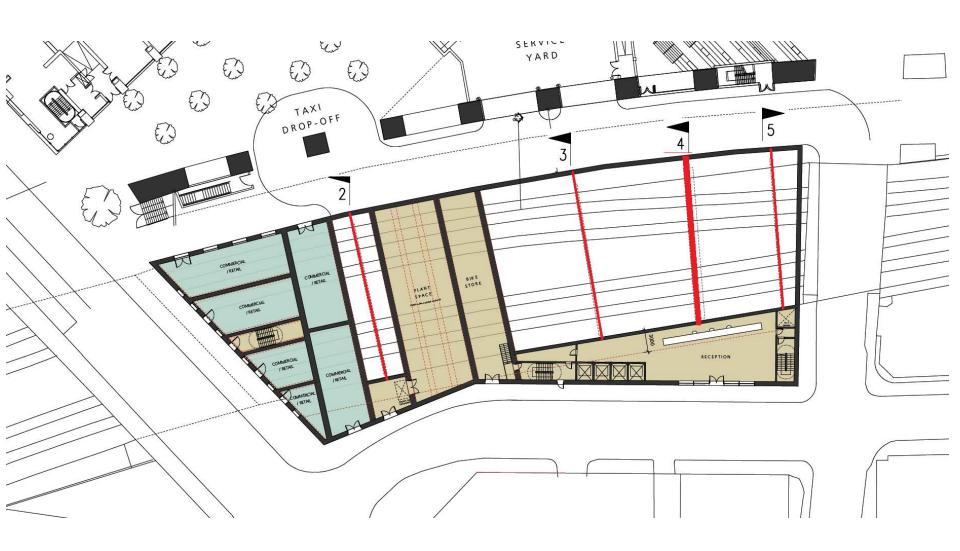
Ground Floor Plan of Plot K – Gantry Locations indicated
